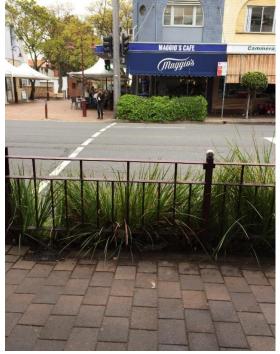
Protection barriers The design of protection barriers for pedestrians on busy Miller Street, Cammeray successfully integrates high quality design and safety.
